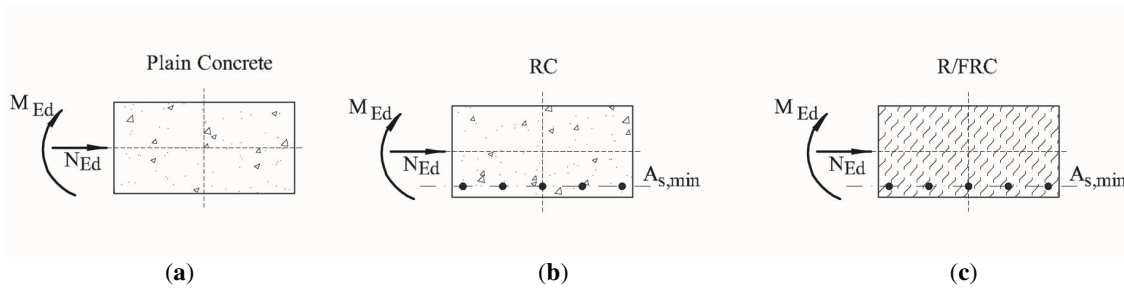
The resisting cross-section of the tunnels: (a) Plain concrete; (b) RC; (c) R/FRC.
